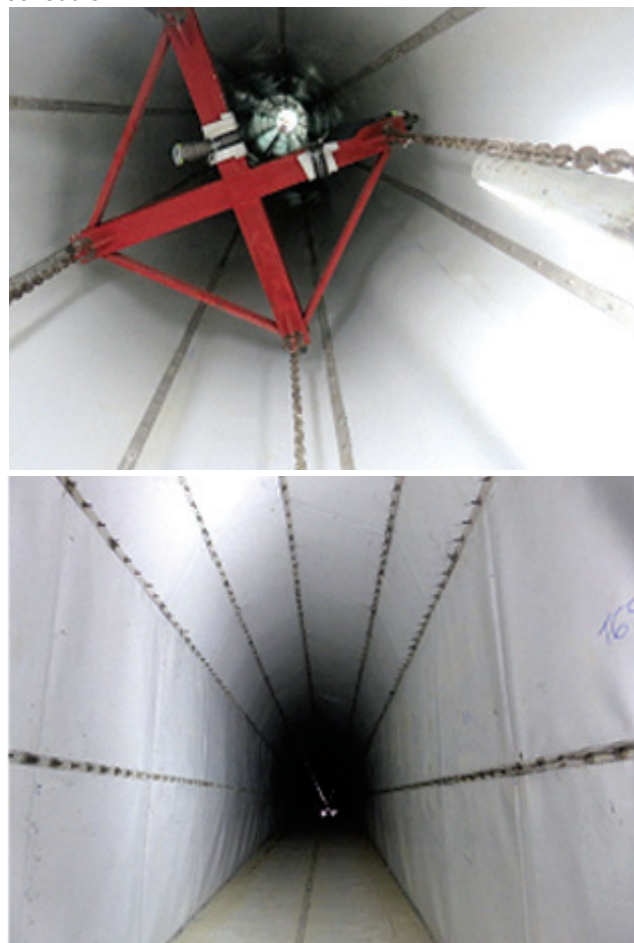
View of the shaft (left) and of the pressure tunnel (right) after installation of the exposed SIBELON® geomembrane system at Tunjita power plant.
